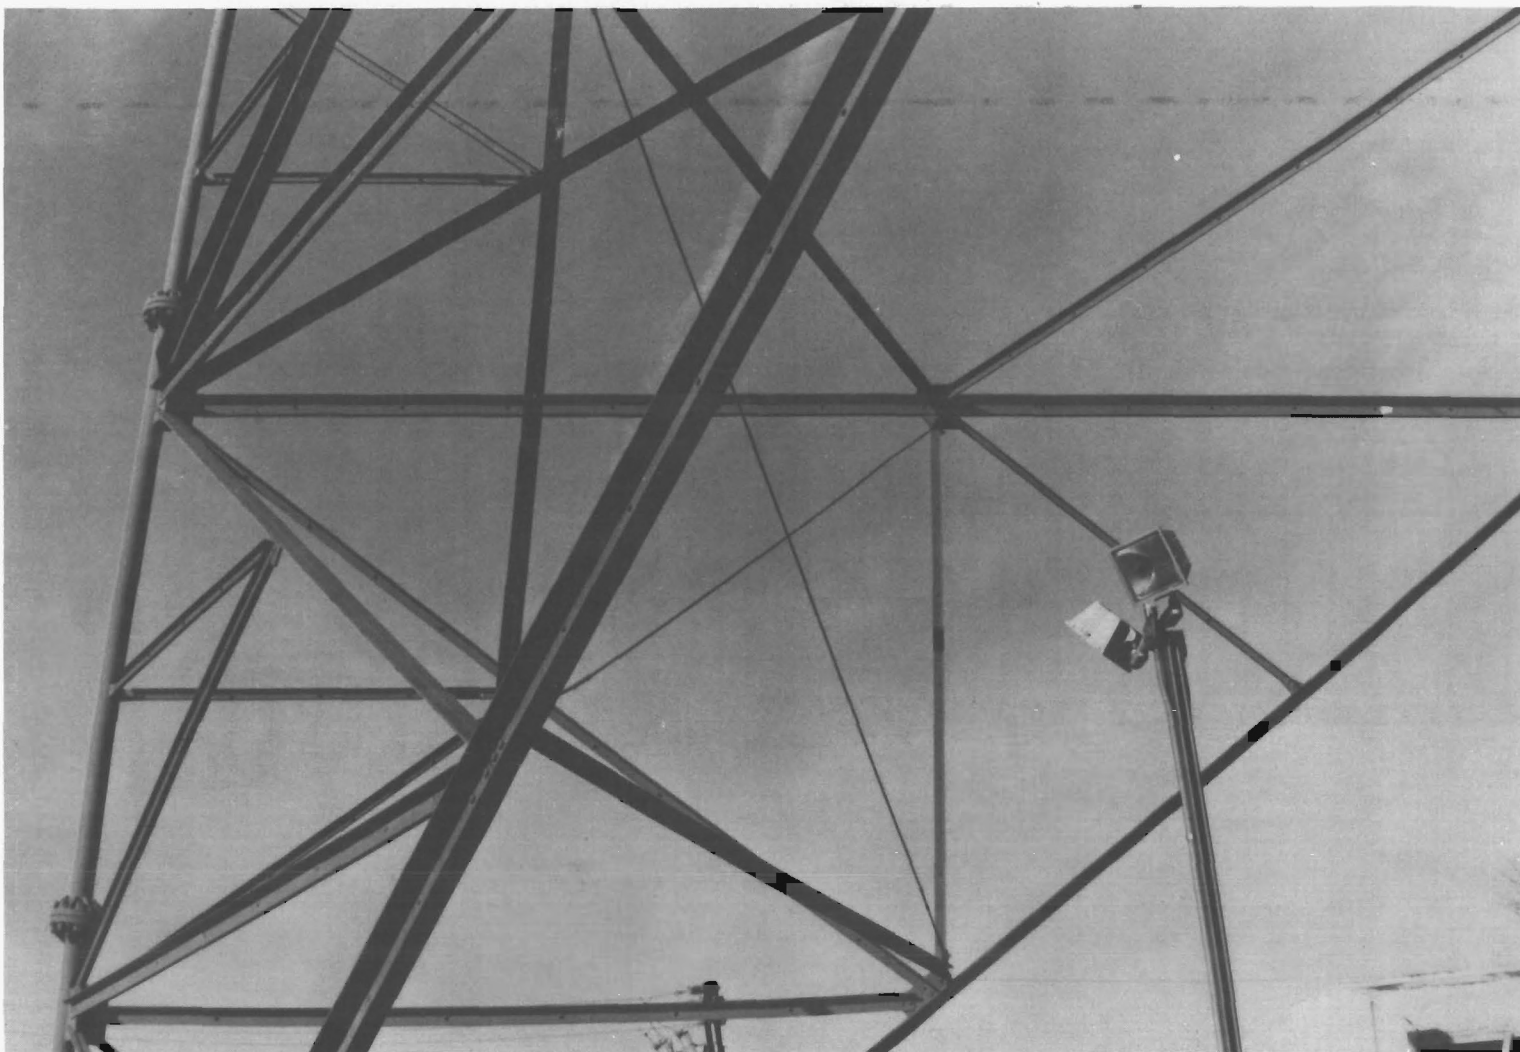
Tension-only Members Supporting Horizontal Bracing
